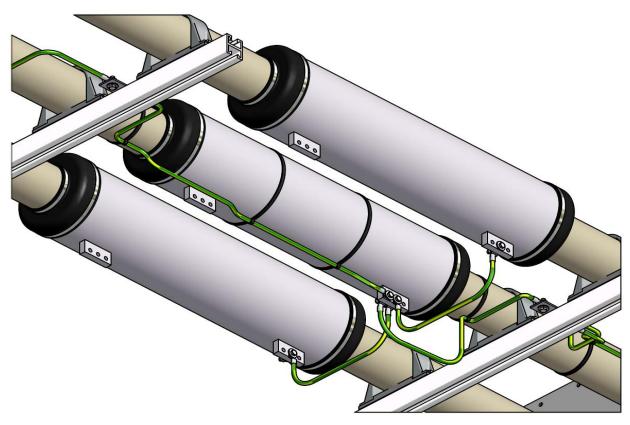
Earthing wiring of sleeves with earth lugs facing down, connected on only one side
